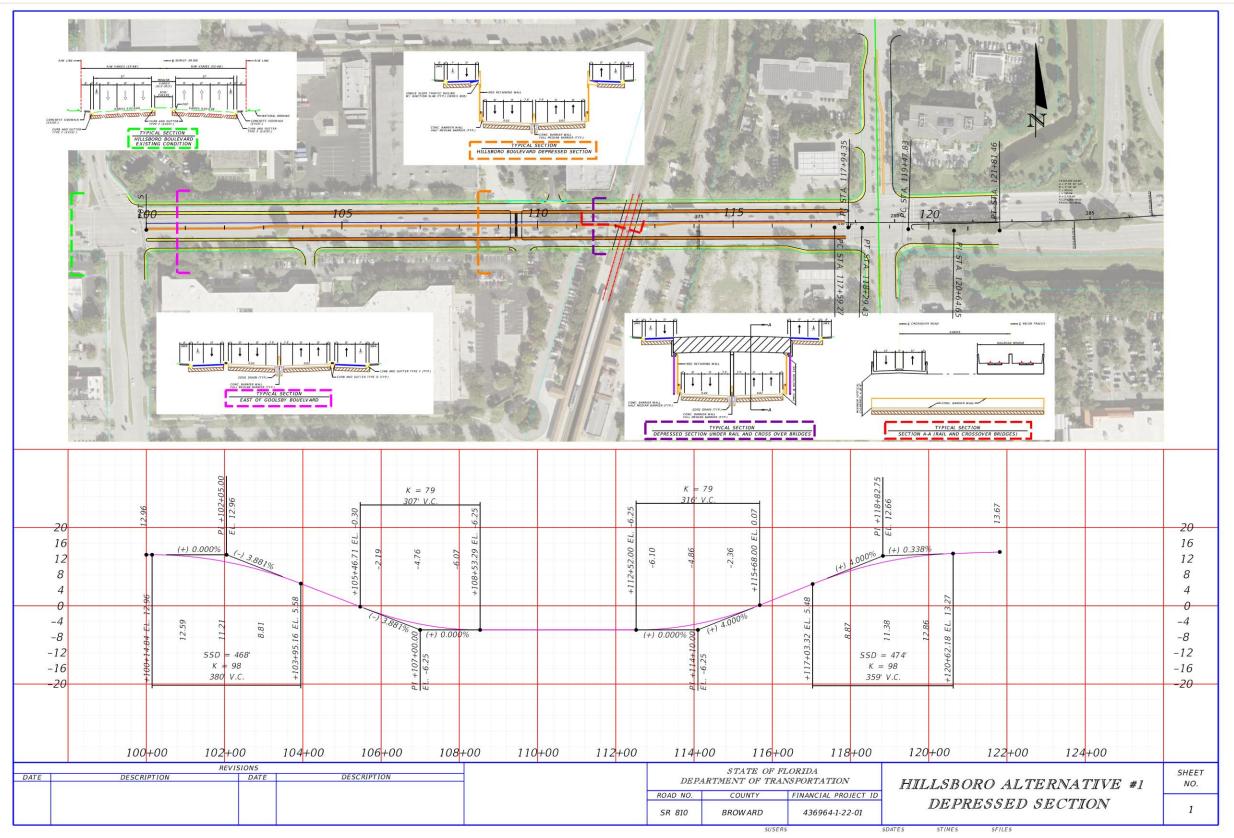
12: Hillsboro Boulevard - Concept Plan - Alternative 1
